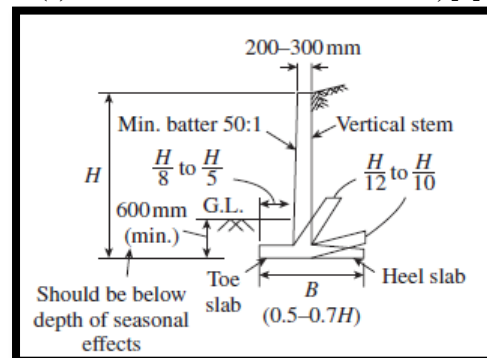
Common Proportions of Cantilever Retaining Wall, [5]
